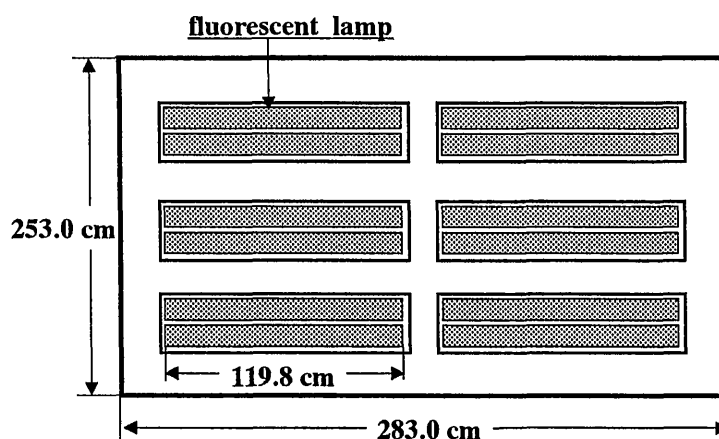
Arrangement of fluorescent lamps on the ceiling.
